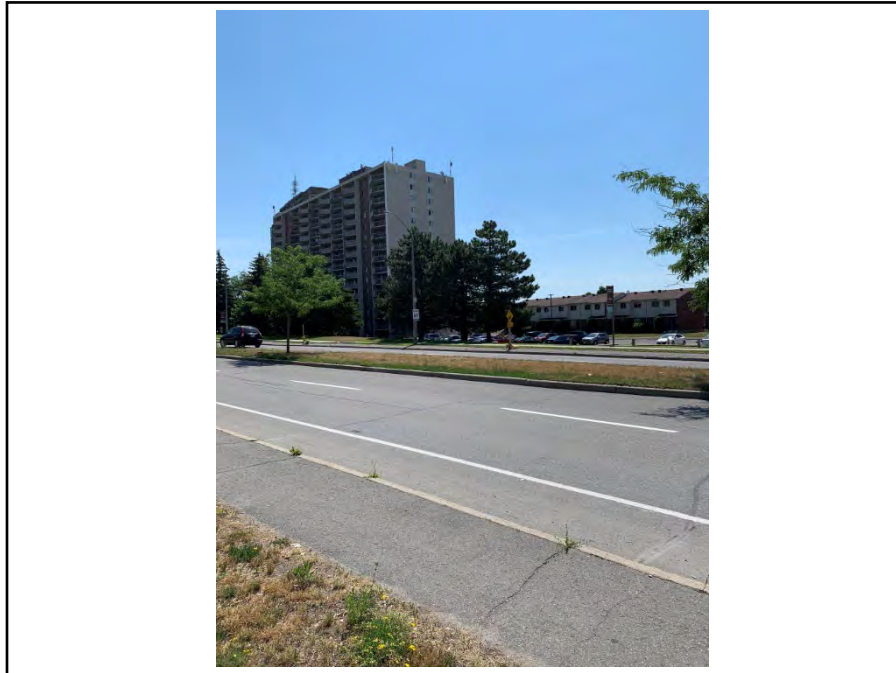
View of Montreal Road facing west from the intersection of Hochelaga St. and Montreal Road.
